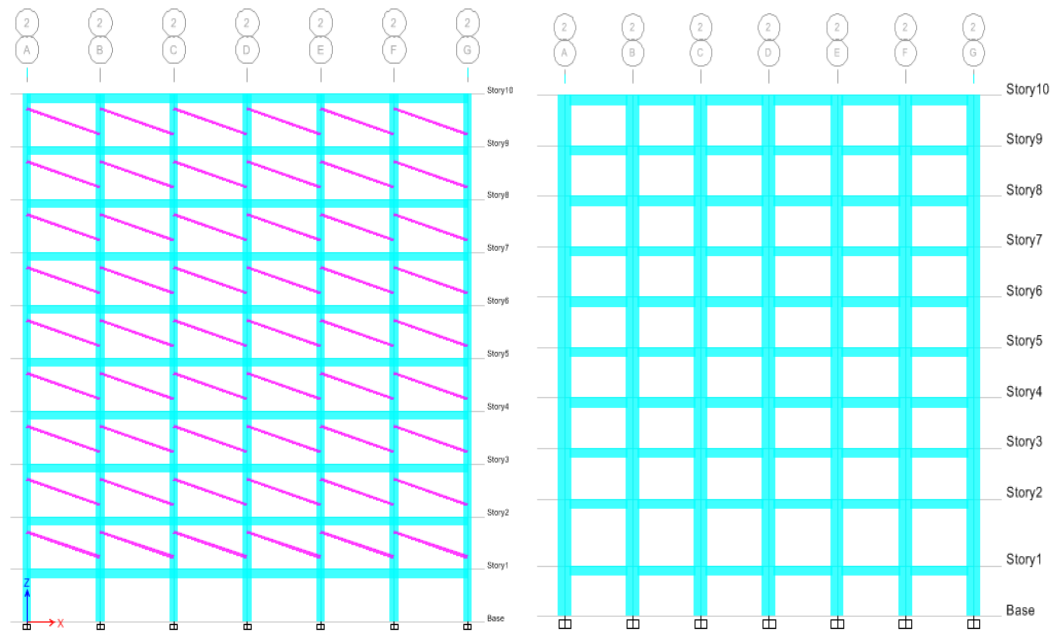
Elevation view. a) For Fully infilled frame b) For bare frame
